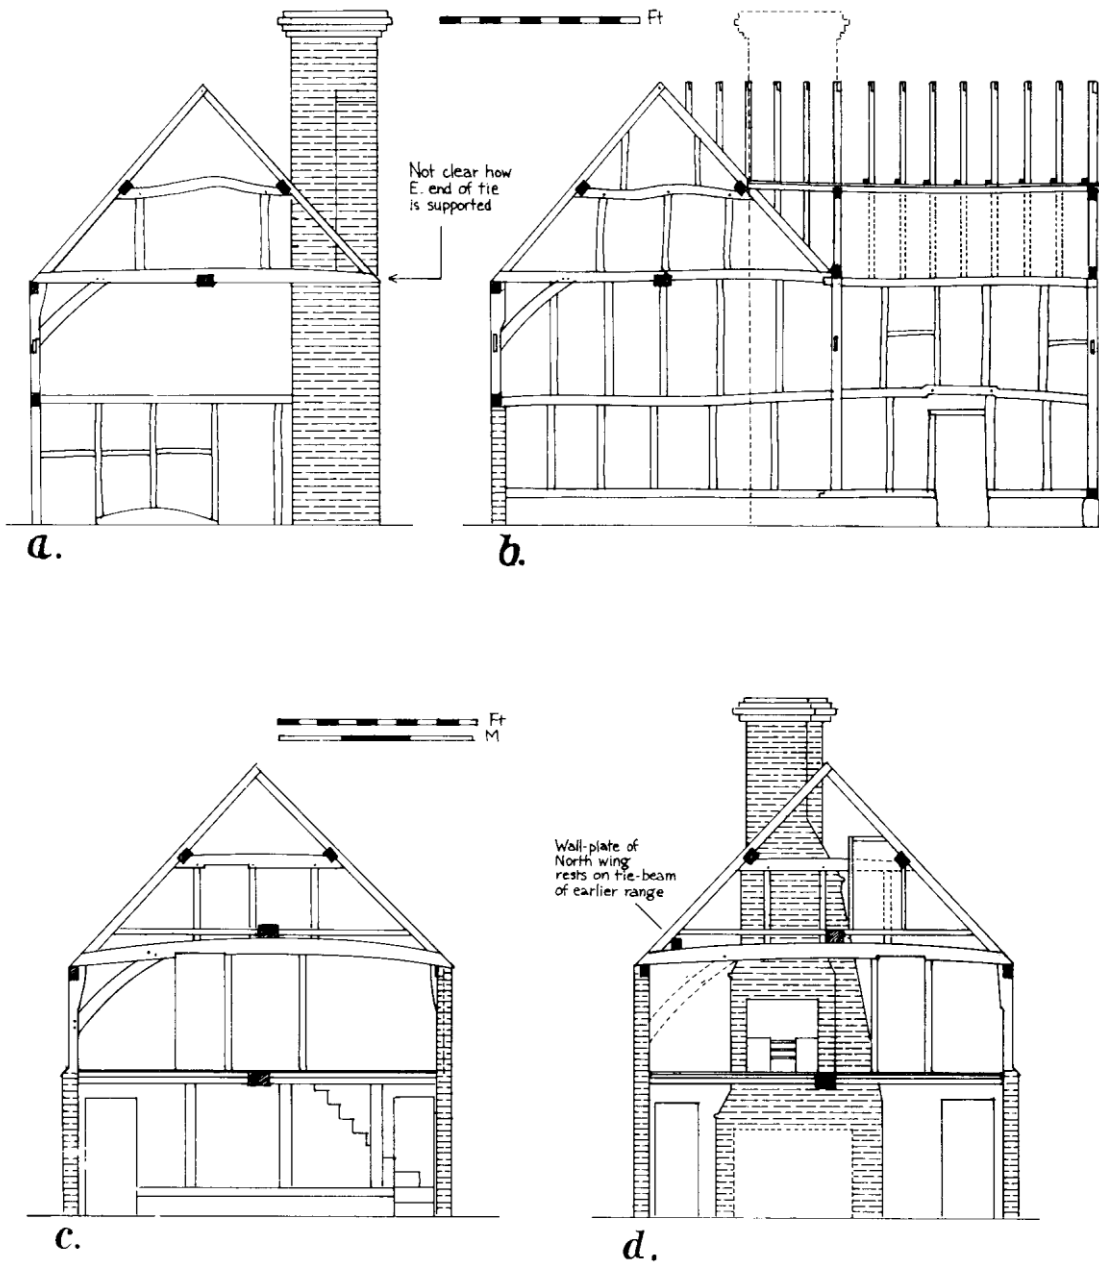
Fagnell Farm, (a) Section at C-C, looking north, (b) Section at D-D, looking north. These two sections, with Fig. 7c, show the inferior timber used for the north range, (c) Section at A-A, looking south, (d) Section at B-B, looking north. The priority of this range is shown by the wall plate of the north range which rests on the tie of this truss.
